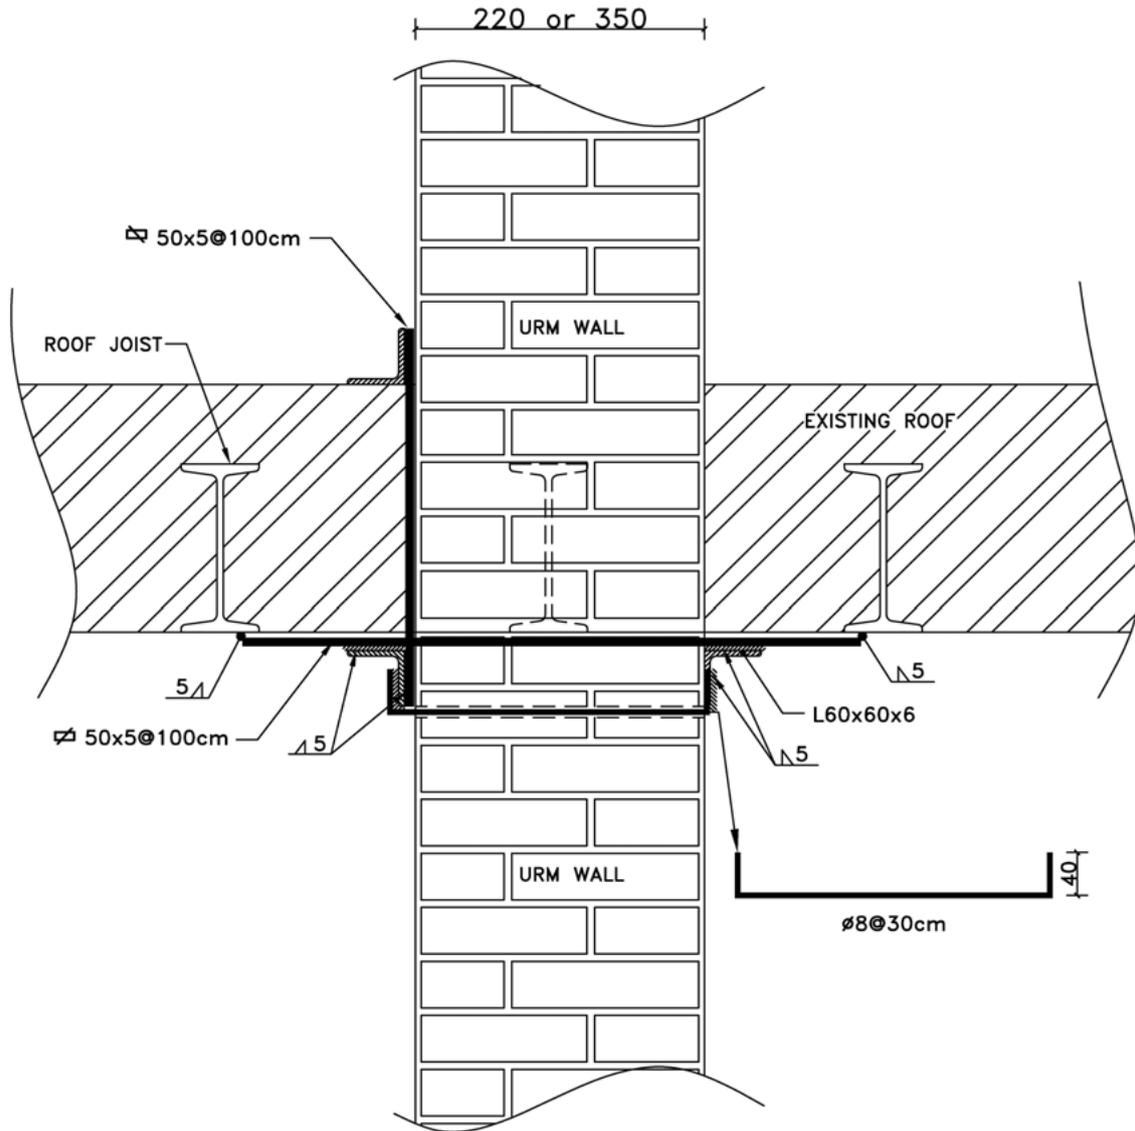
Adding an  $60 \times 60 \times 6 \text{mm}$  angle to connect the wall to the floor where the floor slab joists are parallel to the wall.
